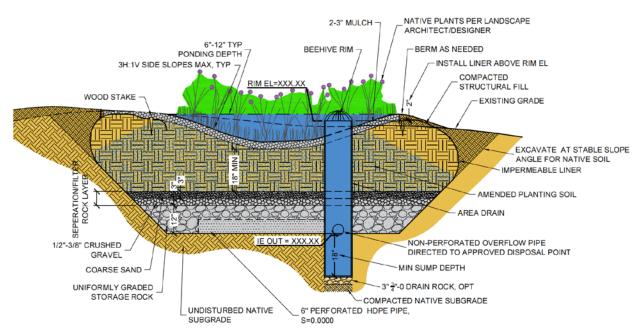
Example of a "Lined Filtration Rain Garden". Not pictured, but also applicable to the above criteria are versions of a stormwater planter or LID swale (see Appendix F Standard Details).
